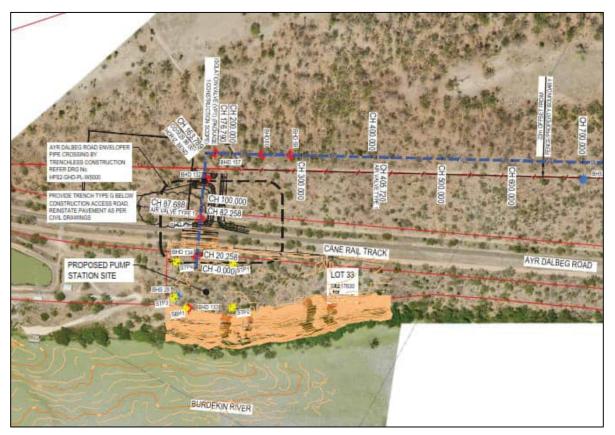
Approved Construction within State Controlled Road – Ayr-Dalbeg Road
